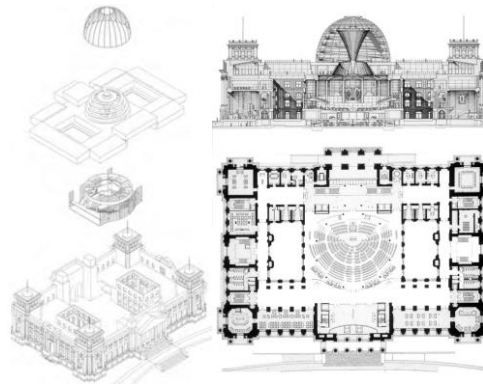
The Installation of Glass Dome above Parliament Hall as Wallot's Dome and its Details [16].
